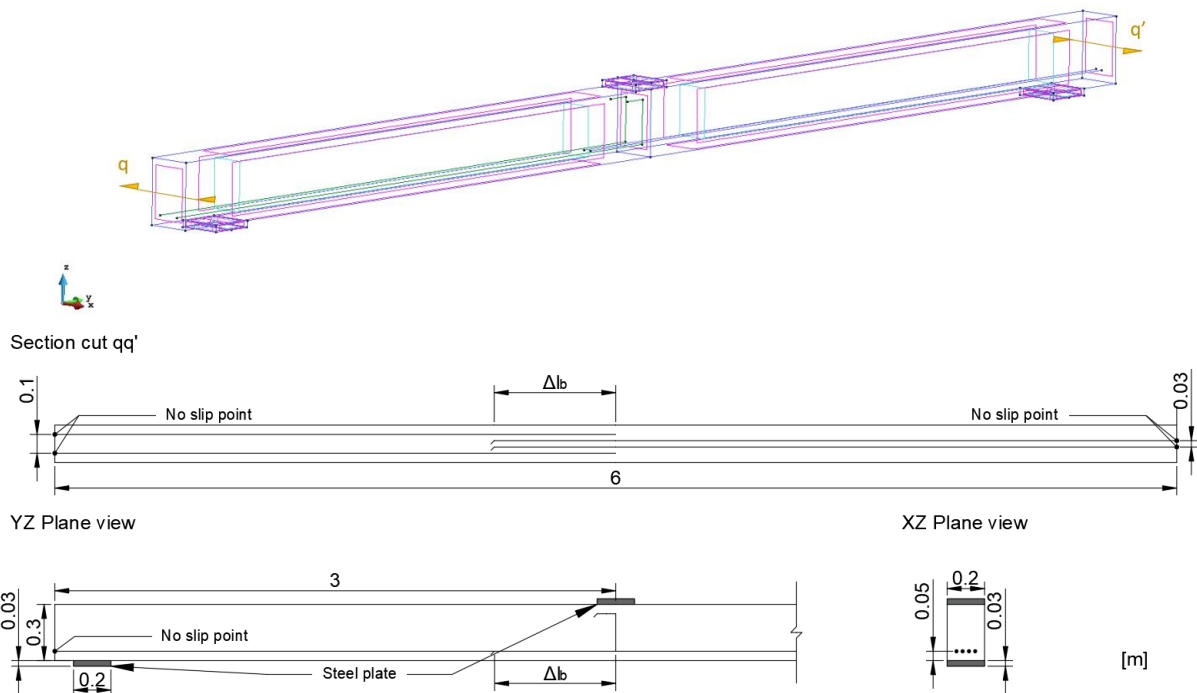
Geometry of the straight anchorage beam model (SAB model).
